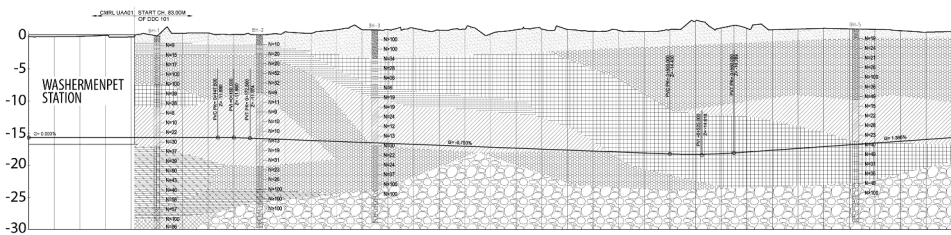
Section of Washermenpet tunnel from geotechnical surveys prior to construction. From CMRL tender documents.
